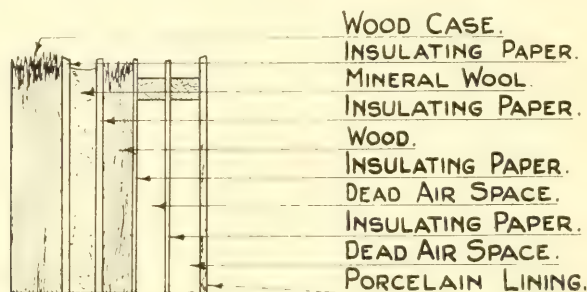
TYPICAL REFRIGERATOR WALL CONSTRUCTION
